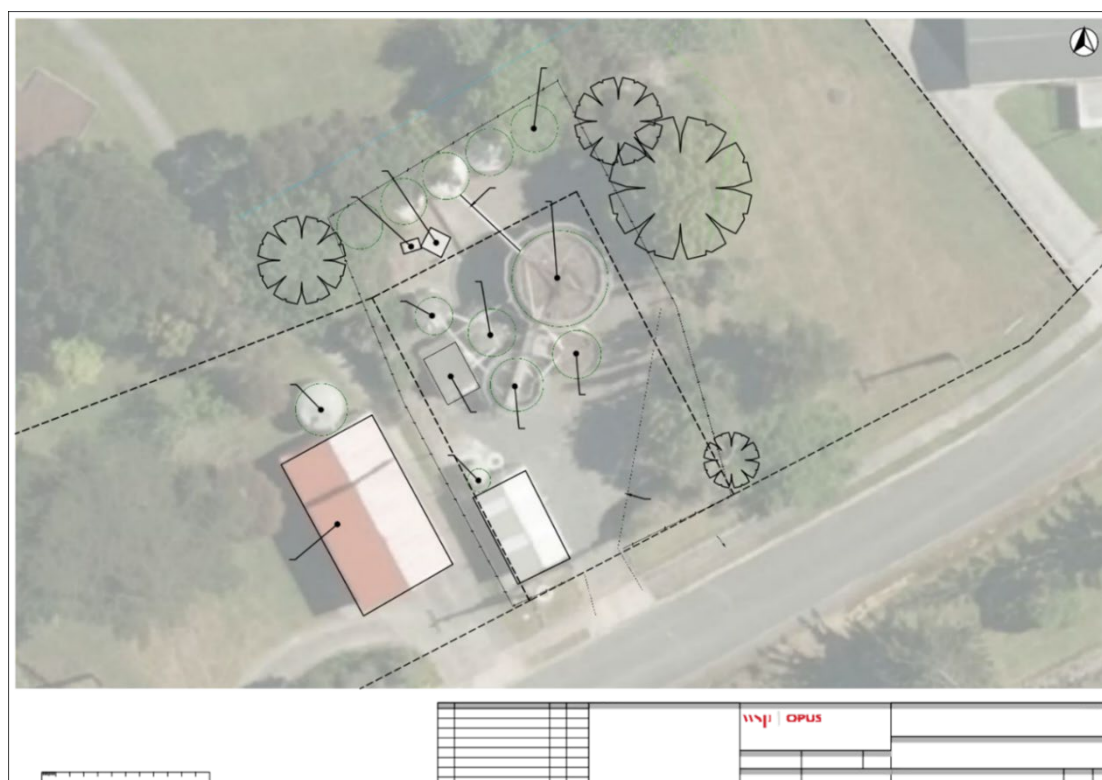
Hihi WWTP, Marchant Road – Site boundary and existing asset layout.
